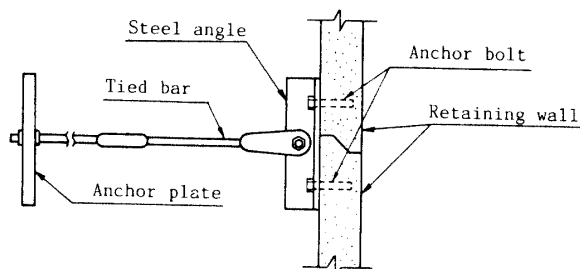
Anchor bolt of multiple-anchored retaining wall
